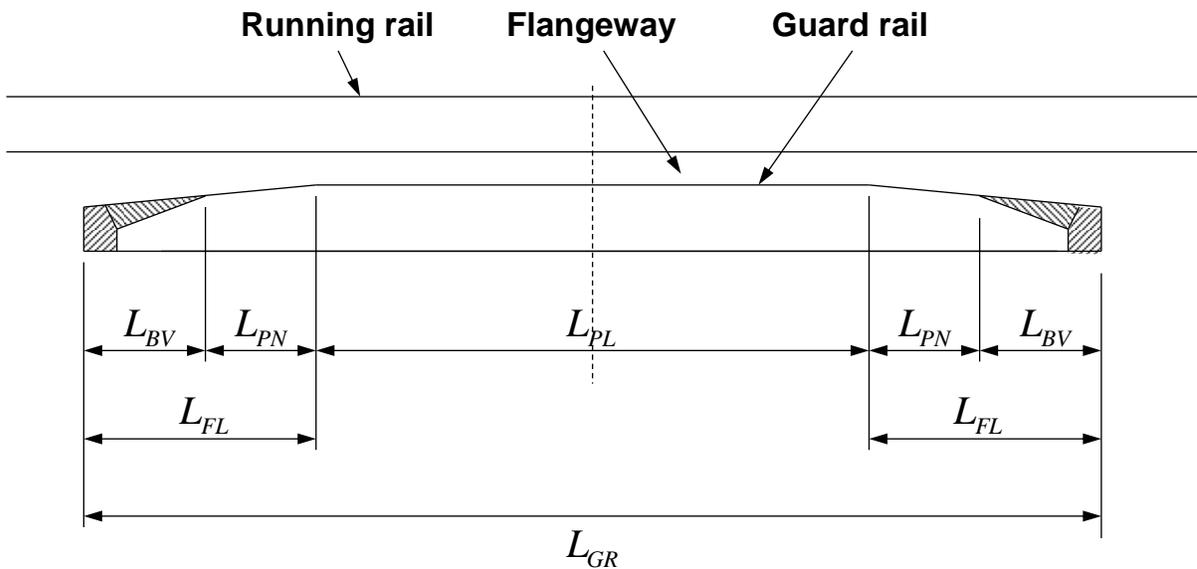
Tee Rail Guard Rail Geometry (not to scale)
